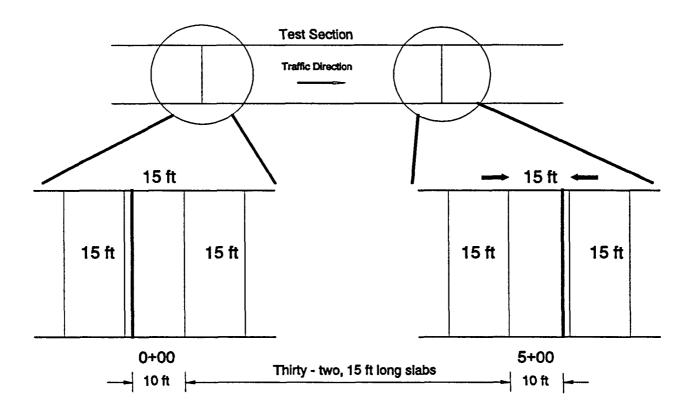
Location of transverse joints relative to section stationing for rigid pavement test sections
